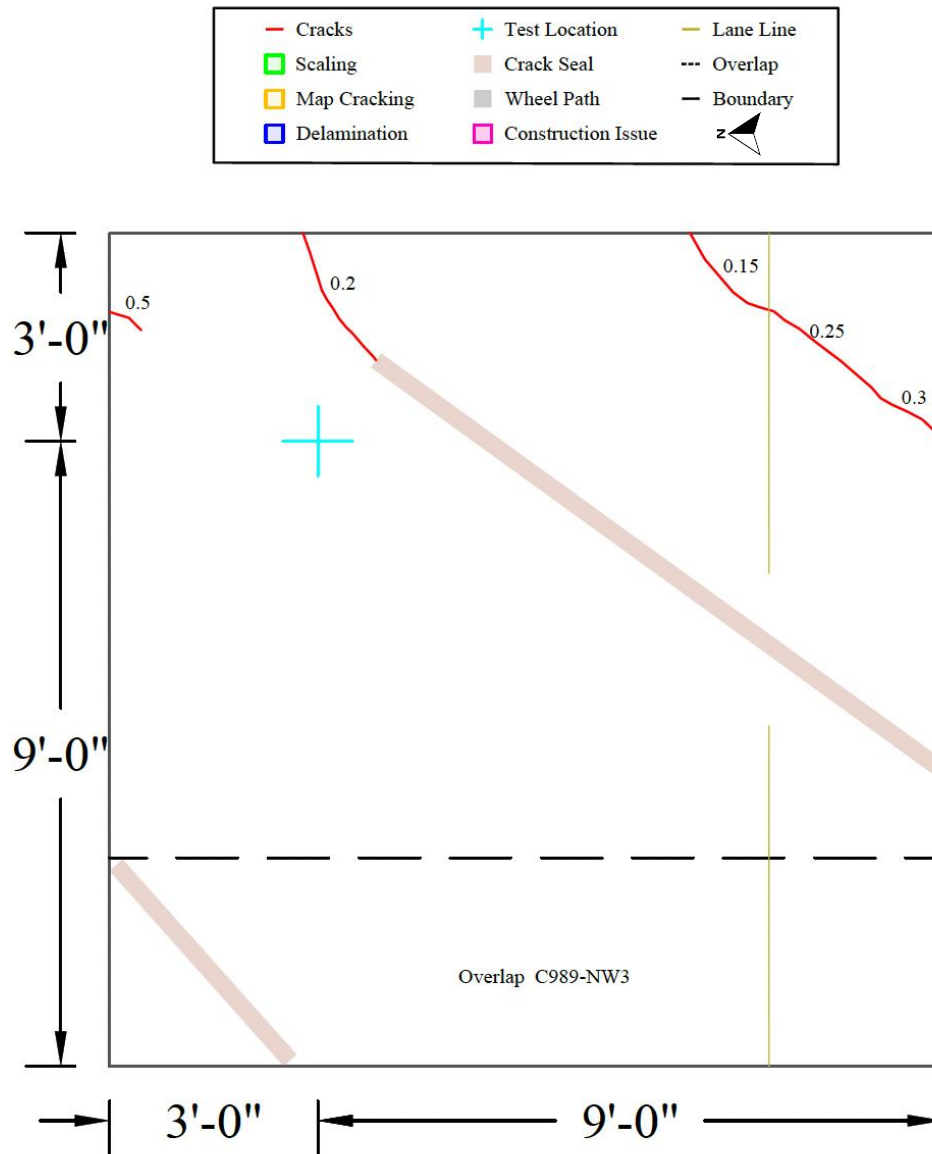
Test location 5 of normal-weight concrete approach slabs at bridge C-989.
